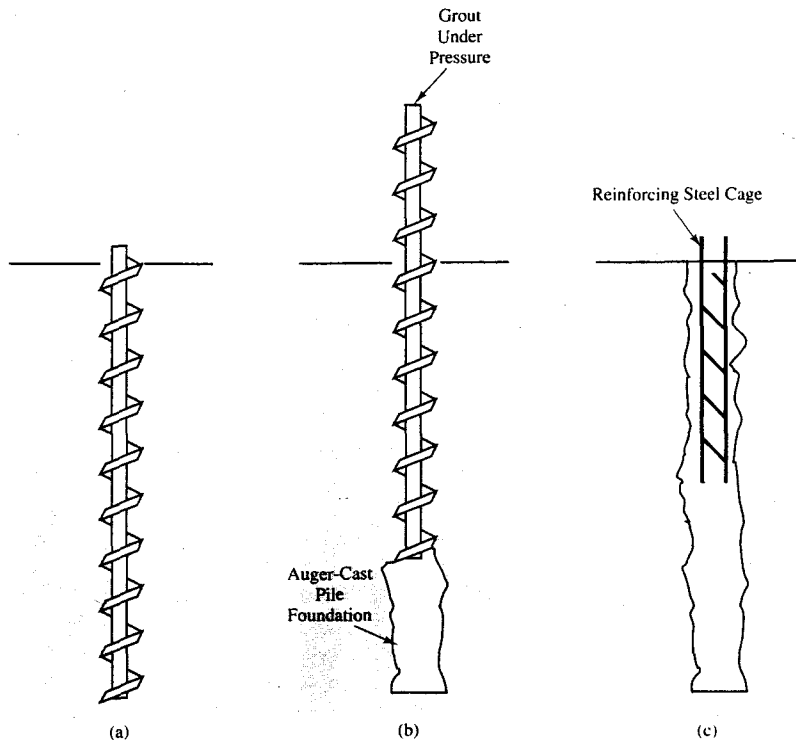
Construction of an auger-cast pile: (a) Drill to the required depth using a hollow-stem auger; (b) Withdraw the auger while injecting cement grout; (c) Install steel rebars (optional).
